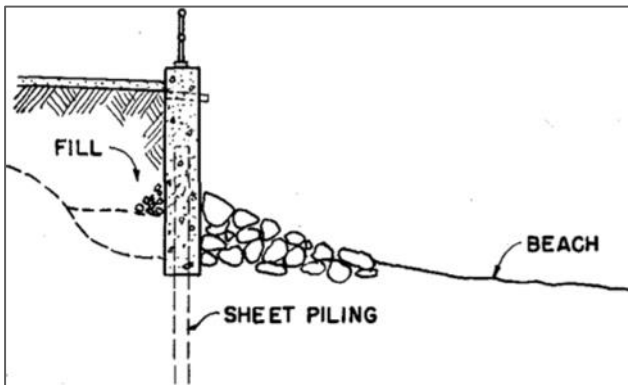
Vertical face concrete piling seawall (Ayers, 1950)
